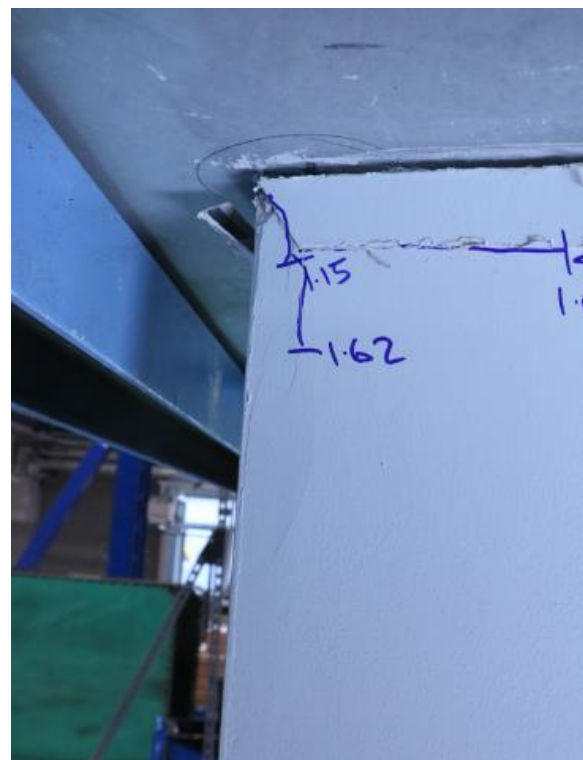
Specimen B2 – Step 14 – DS2a: Wallboard damage to end wall – location 20/21
